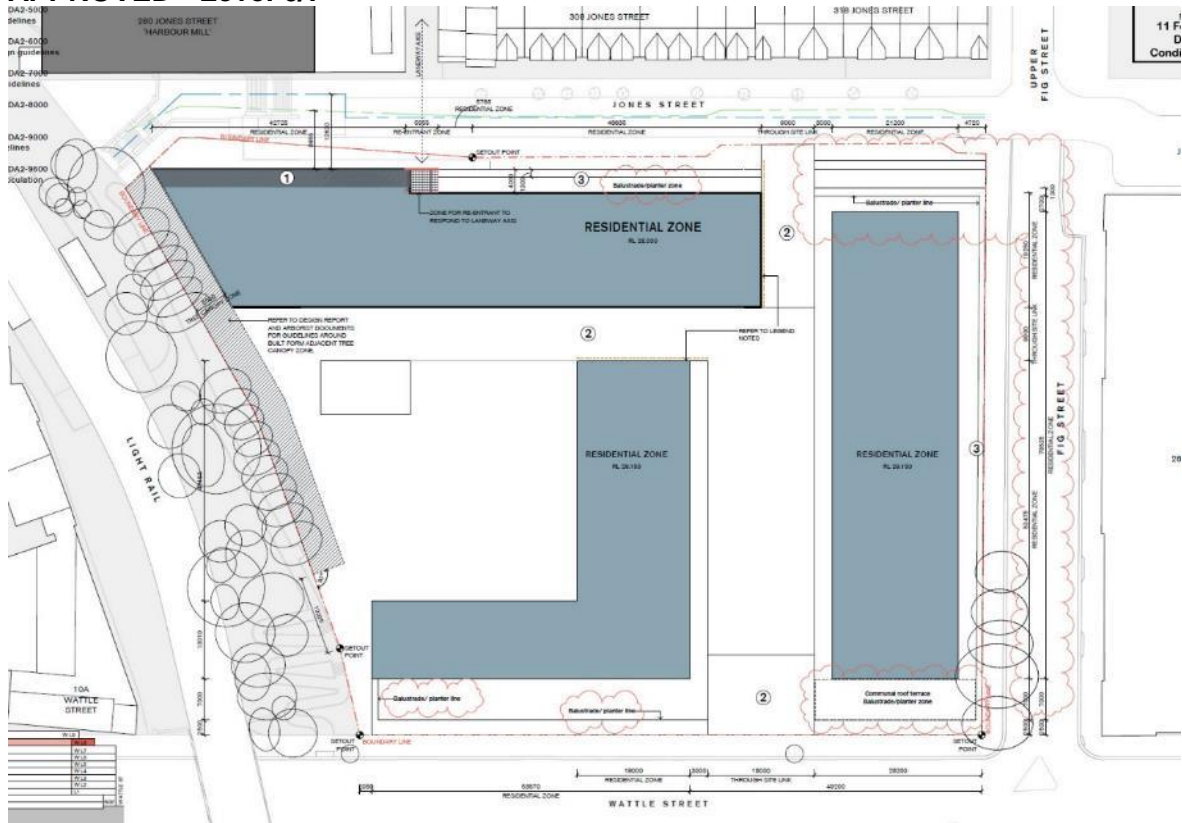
Envelope plans: Approved Level 5/6 and proposed Level 06/07
